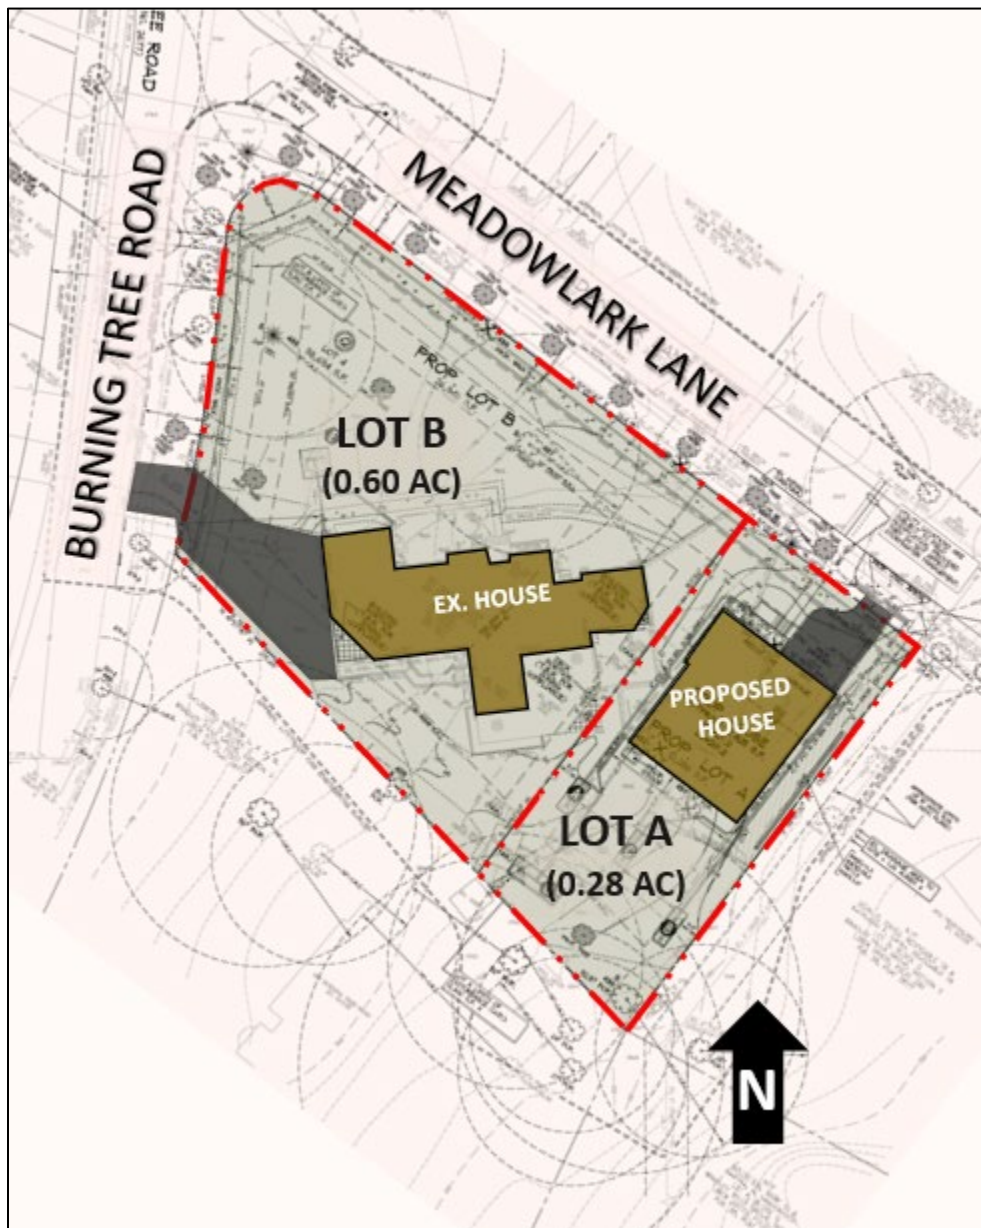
Proposed Administrative Subdivision Lotting Diagram with Illustrative Building Footprints
